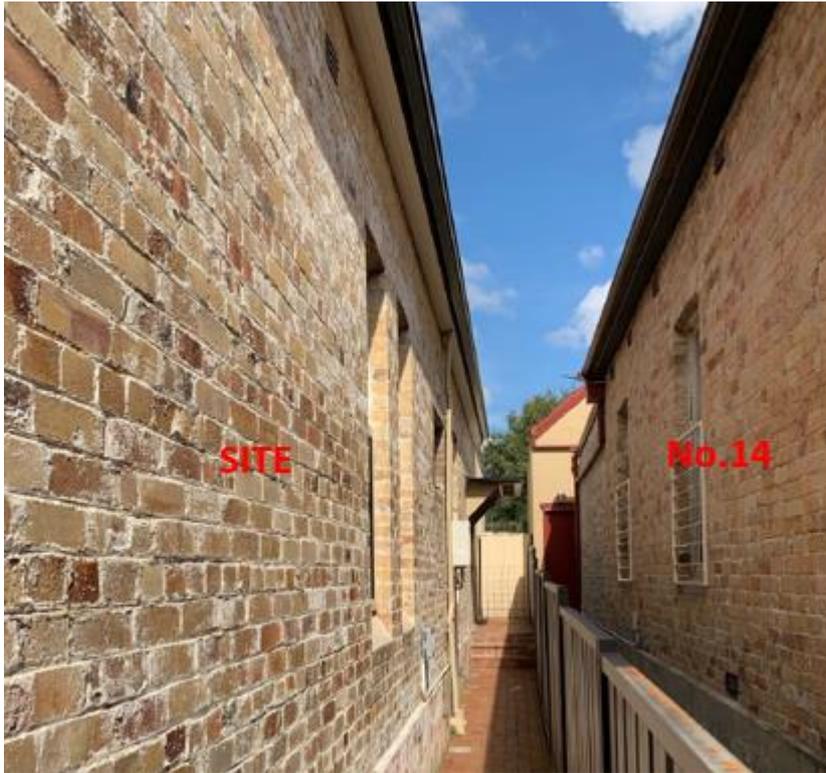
View of the side passage between the subject site and No. 14 Toxteth Road
